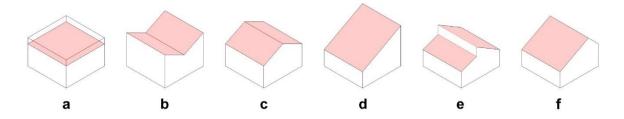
Schematic drawing of the roof types: Roof Deck (a); Butterfly Roof (b); Gable Roof (c); Sched Roof (d); Clerestory Roof (e); Saltbox Roof (f). Prepared by the Author.
